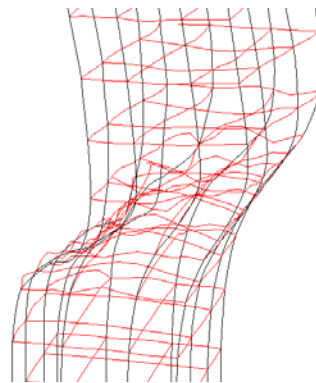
Damage Mechanism A3: Severance of Rebars in the Pier Steel Cage
